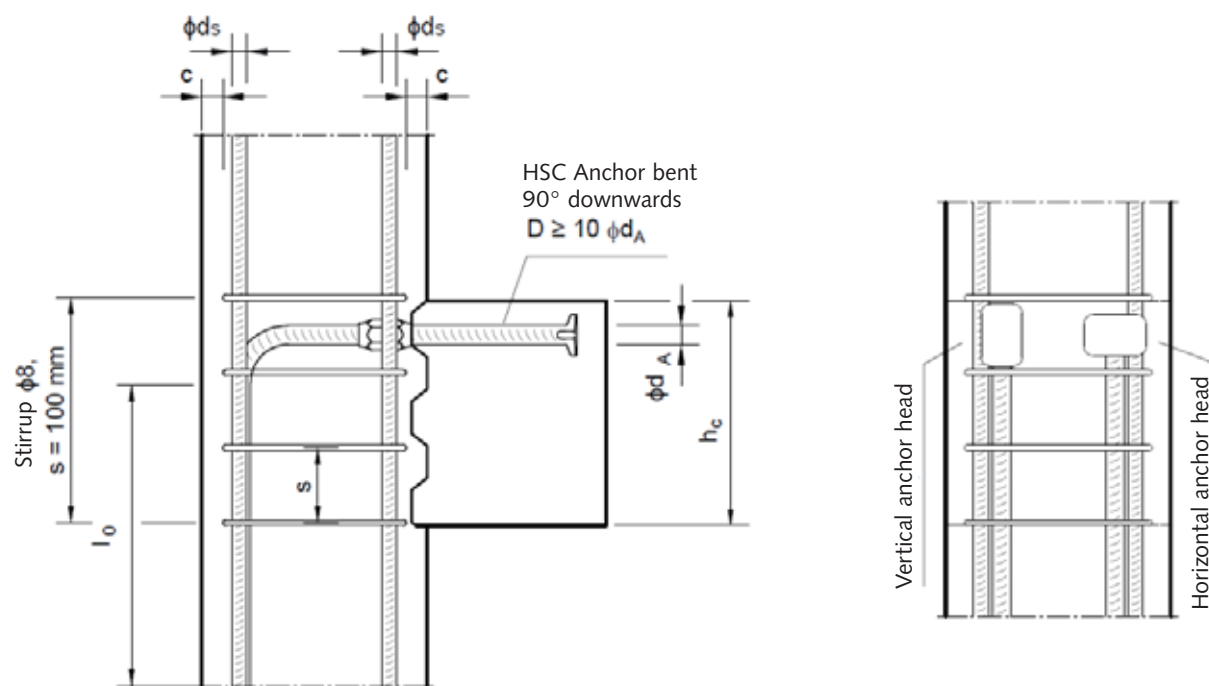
HSC Anchors reinforcement in the column, bent 90° downwards, example
